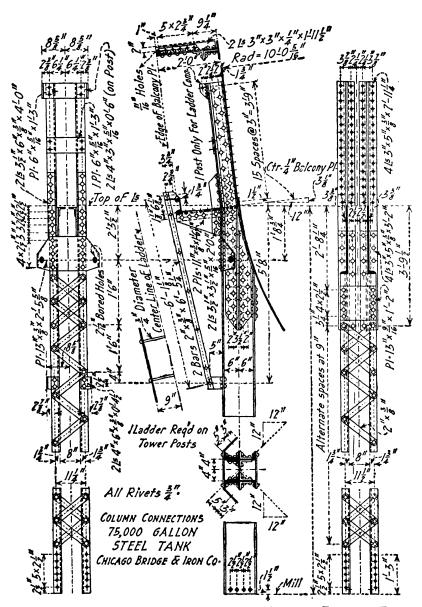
Details of Column Connections for Elevated Tank and Tower. Chicago Bridge & Iron Co.
